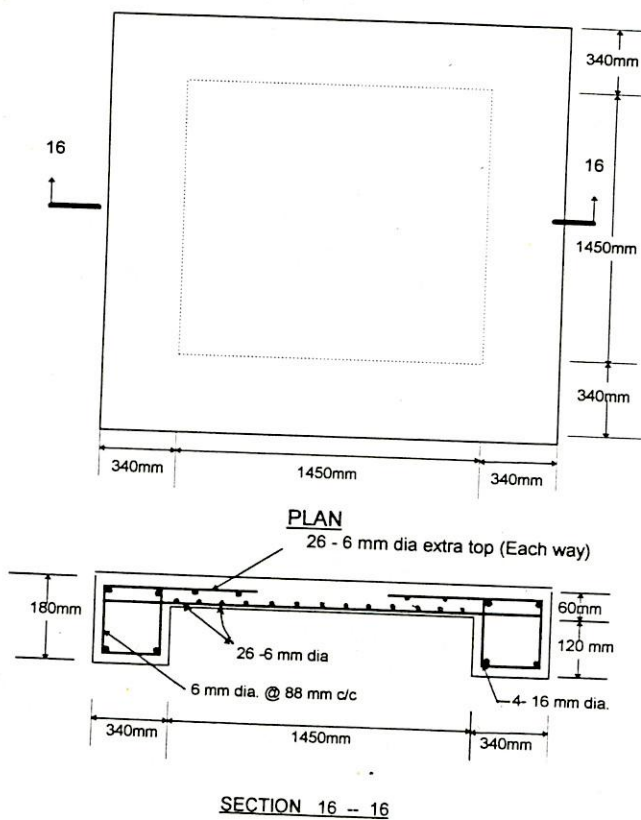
(a) Plan (b) Section and reinforcement details of SLAB16
